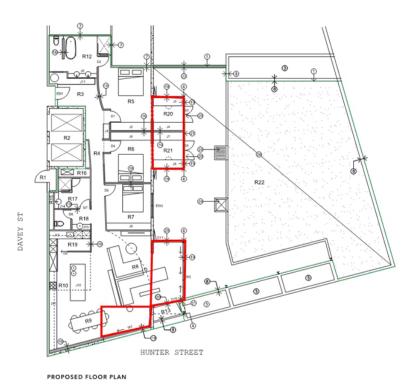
Proposed site plan, with the proposed works bordered (approximately) in red. Hunter Street is on the bottom of the image.
